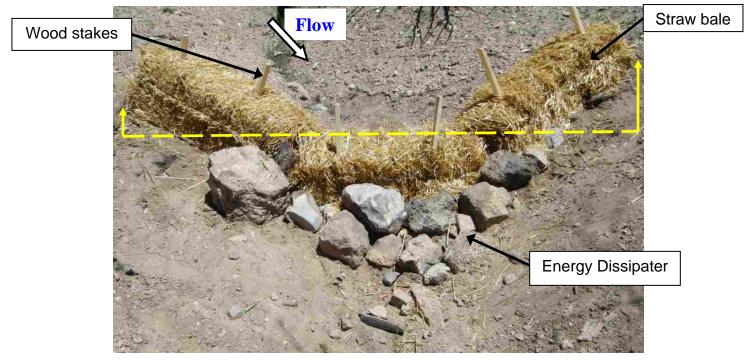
Down-channel face of a straw bale check dam at ground level looking up-channel. Straw bales are keyed into the bed and banks to create a U-shaped structure that spans the width of the channel. Bottoms of bookend straw bales (yellow arrows) sit vertically higher than top of the center spillway bale (yellow dashed line). Energy dissipator rocks sit against the structure on the down-channel side below the center spillway to help reduce scour to the channel-bed.
